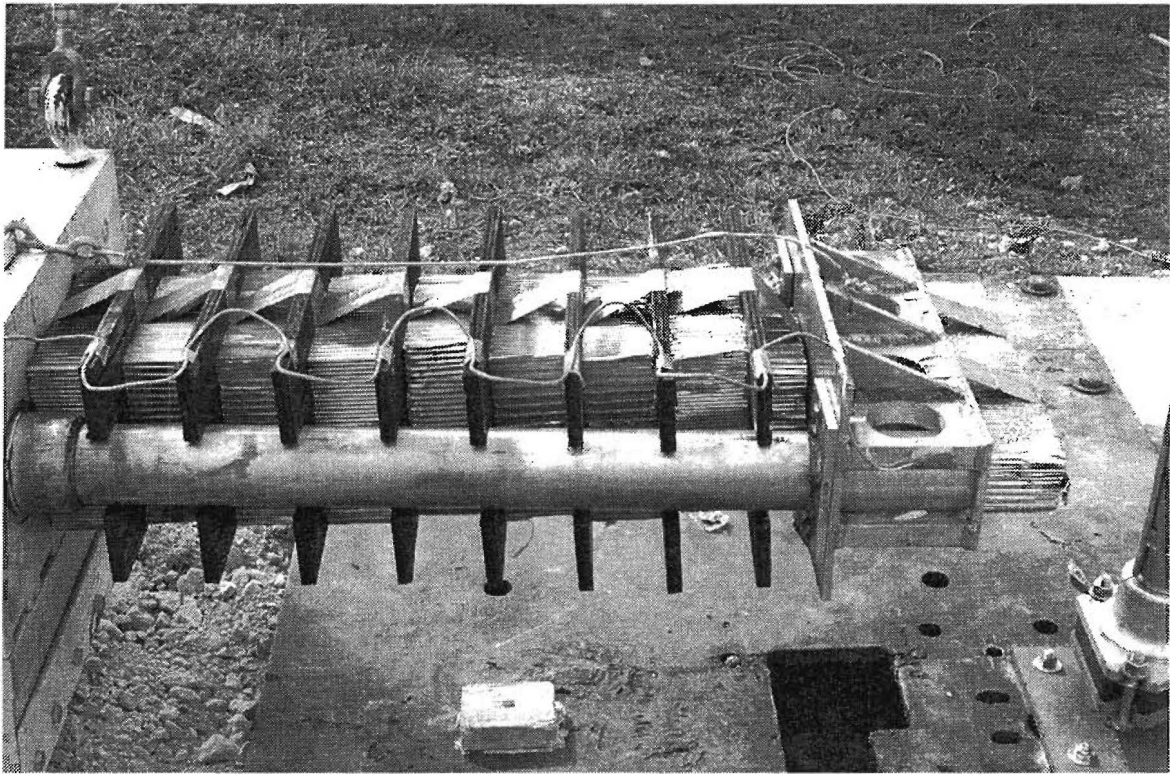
Details of Test Installation for 417929-P4 (Continued).
